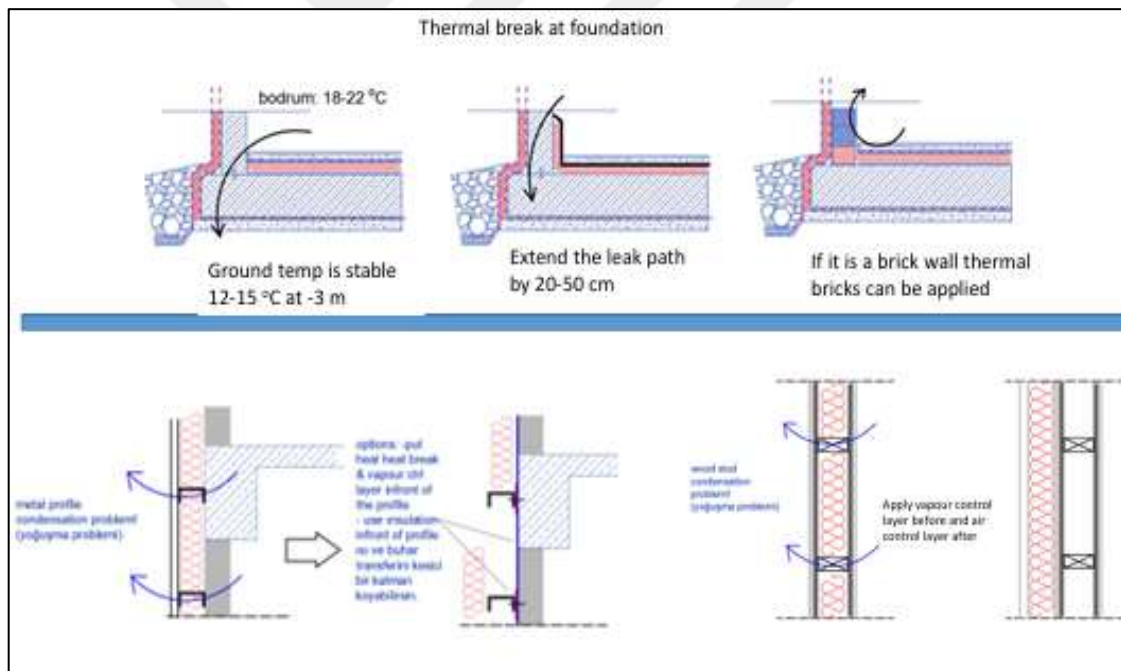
Thermal Bridge Examples and Possible Solutions for Foundations.
